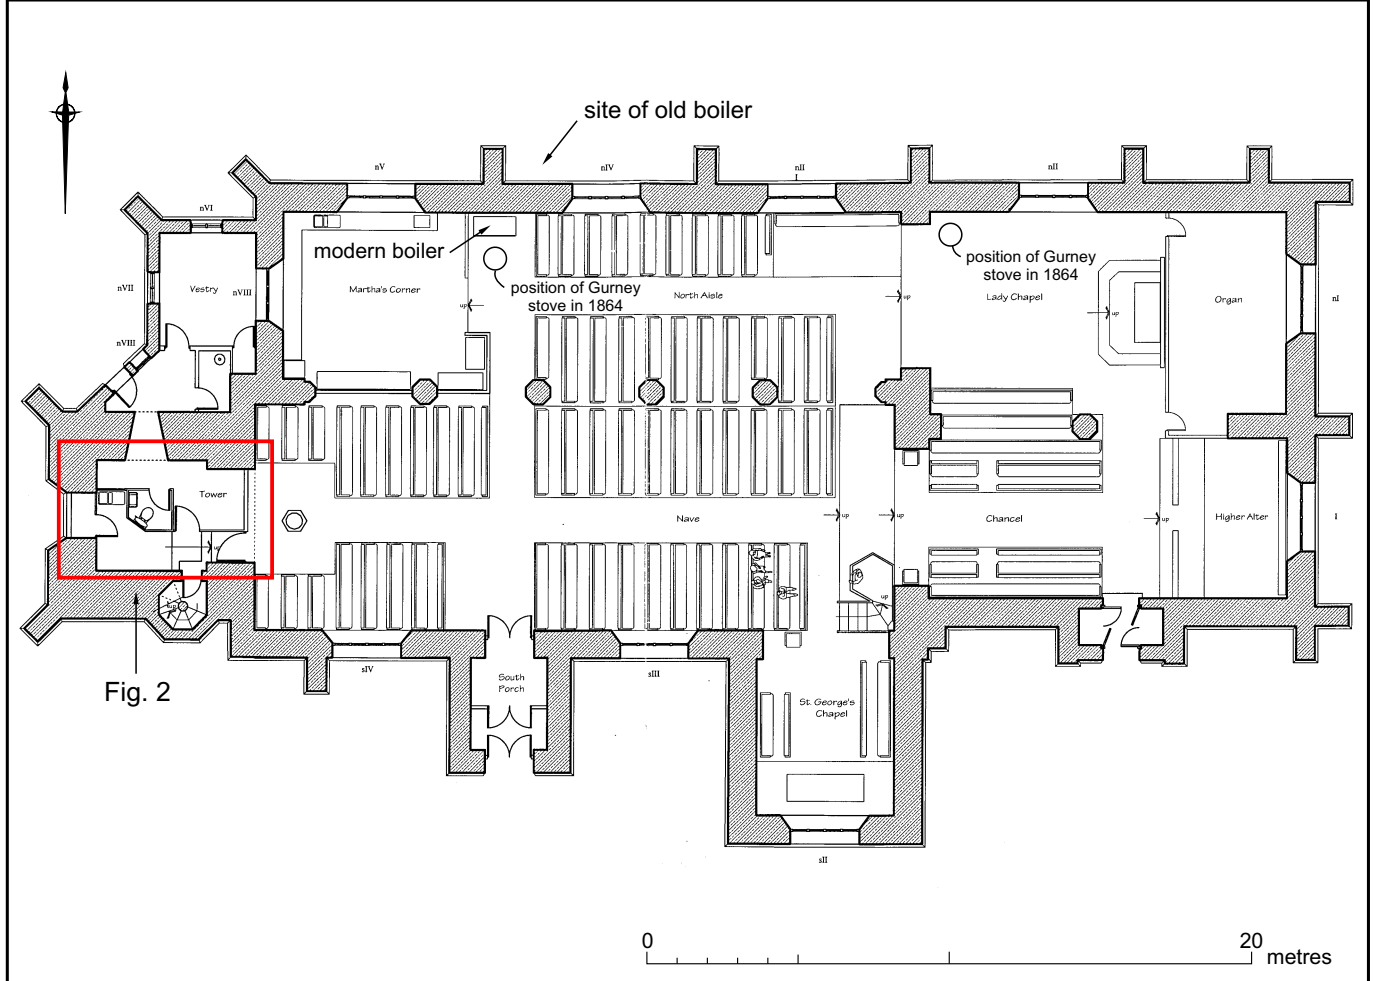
Location of site and plan of church (based on plan supplied by Jonathan Rhind Architects).
